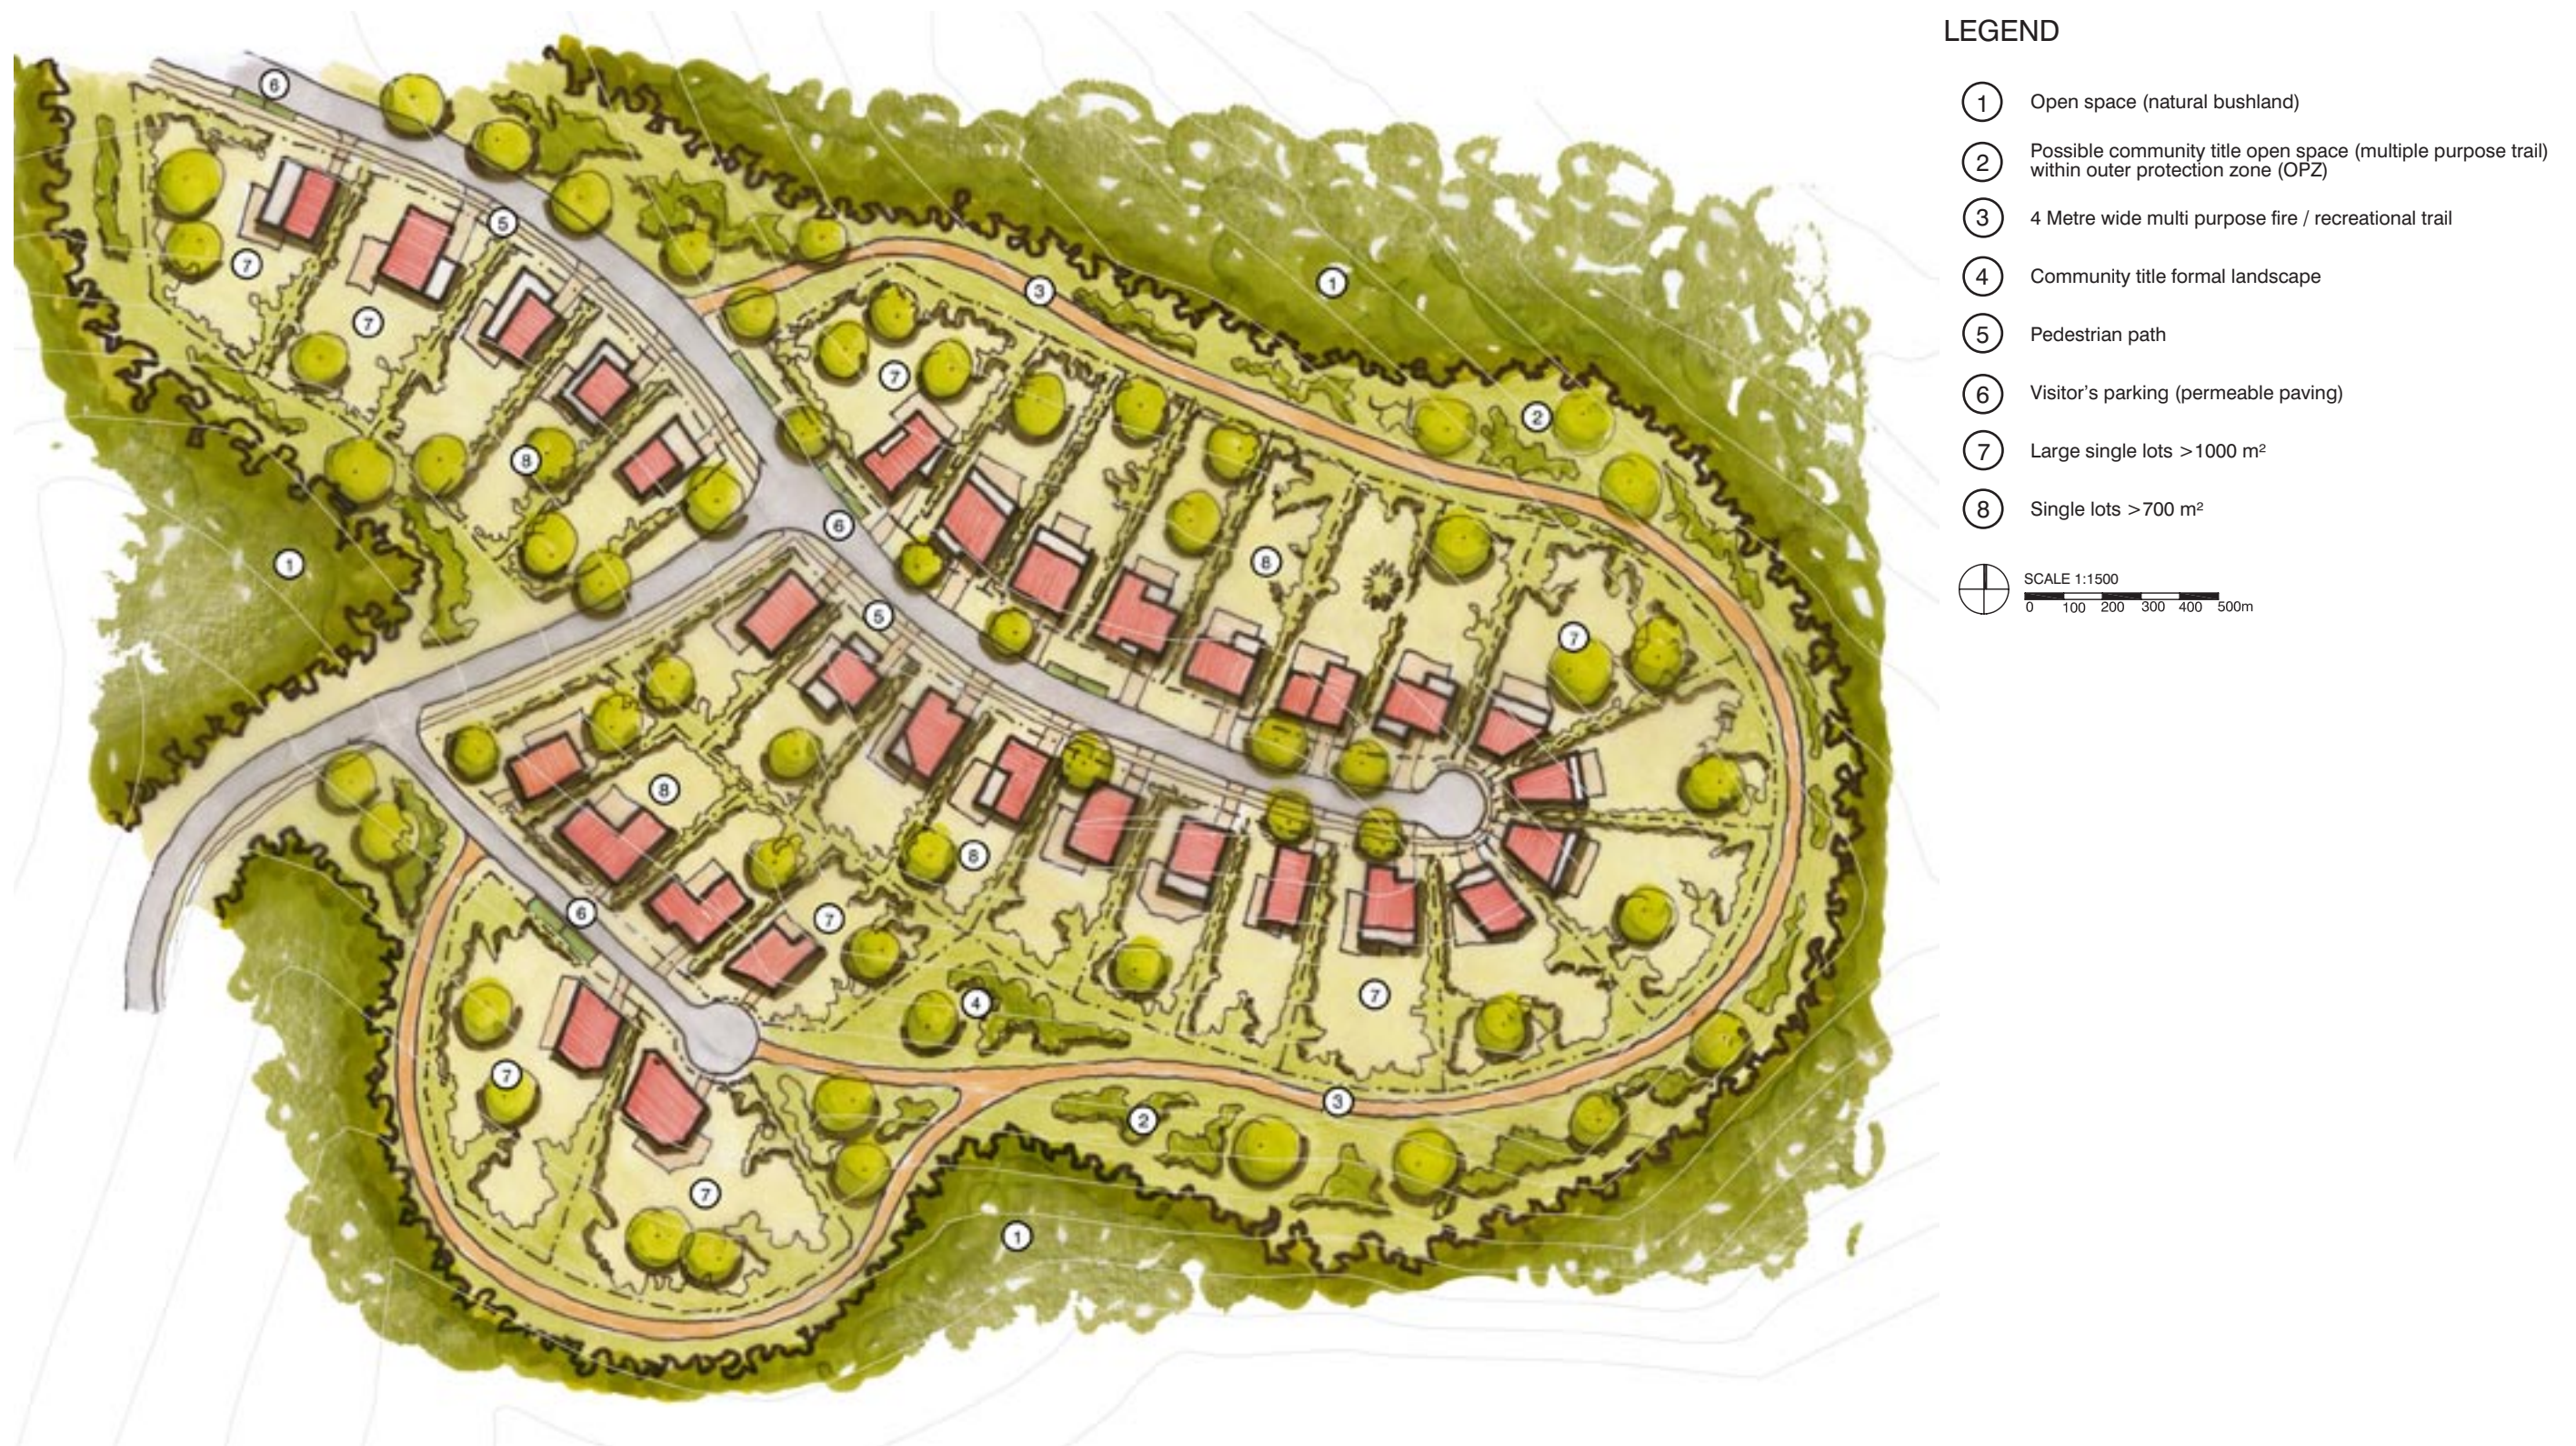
Partial plan showing different lot groups and the interaction between open spaces
